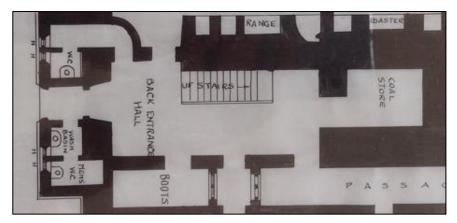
Extract from the 1909 plan of the building, ground floor of Cell F
